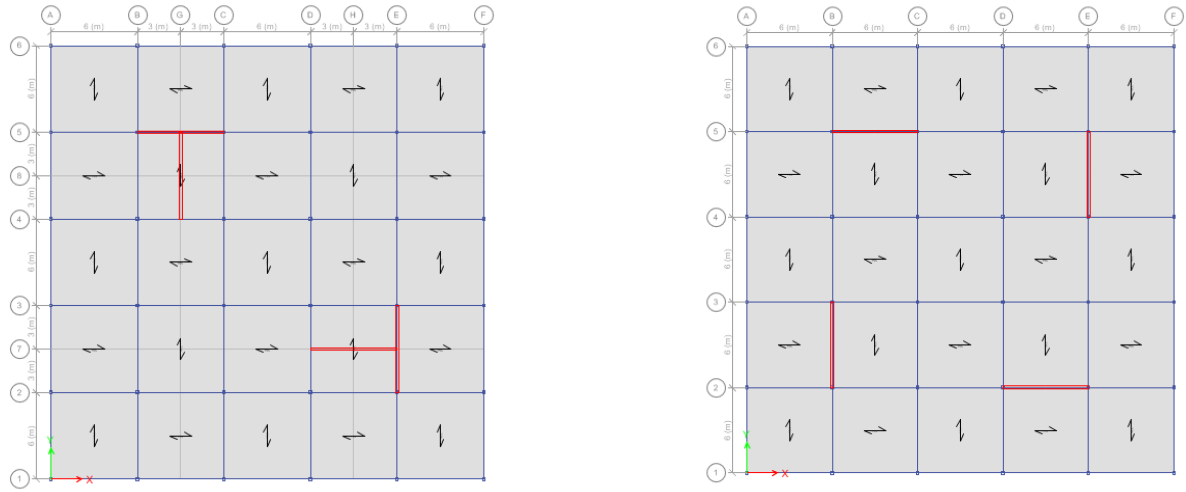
Placement of rectangular and T-shaped shear walls in the plan of a 20-story building.
